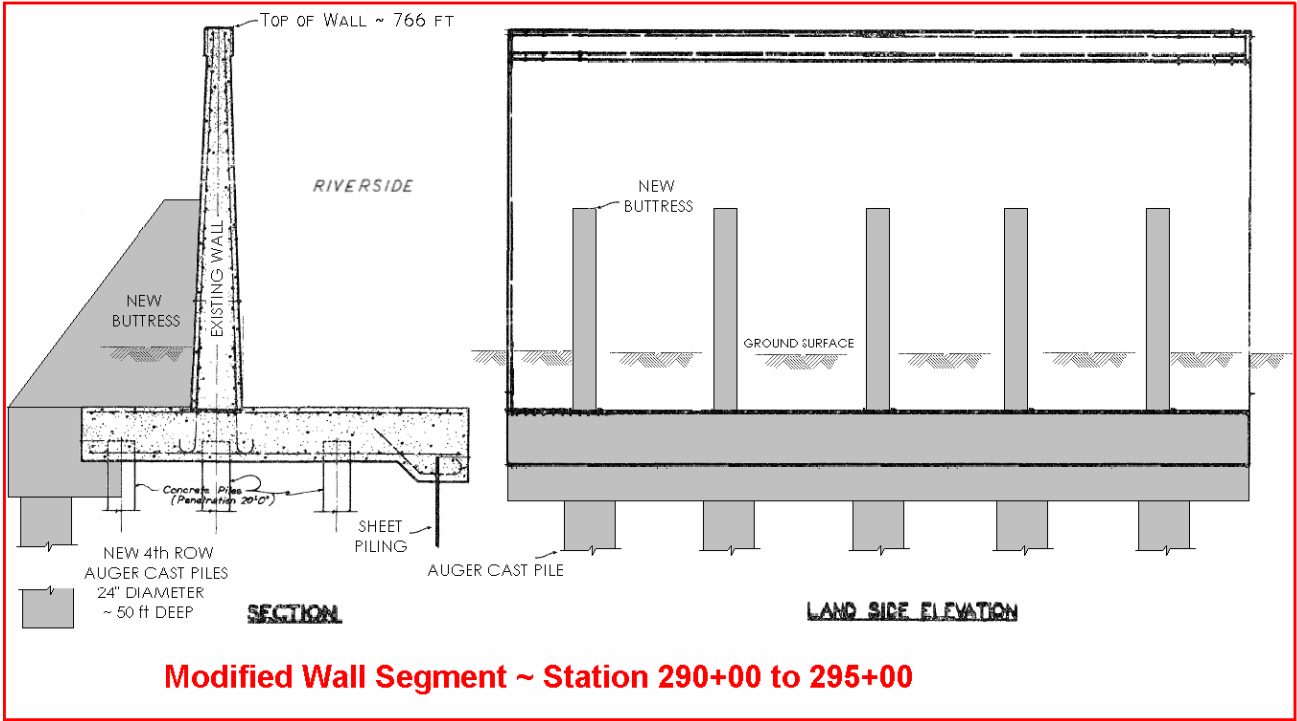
Combined Modified and Replacement Floodwall Alternative
